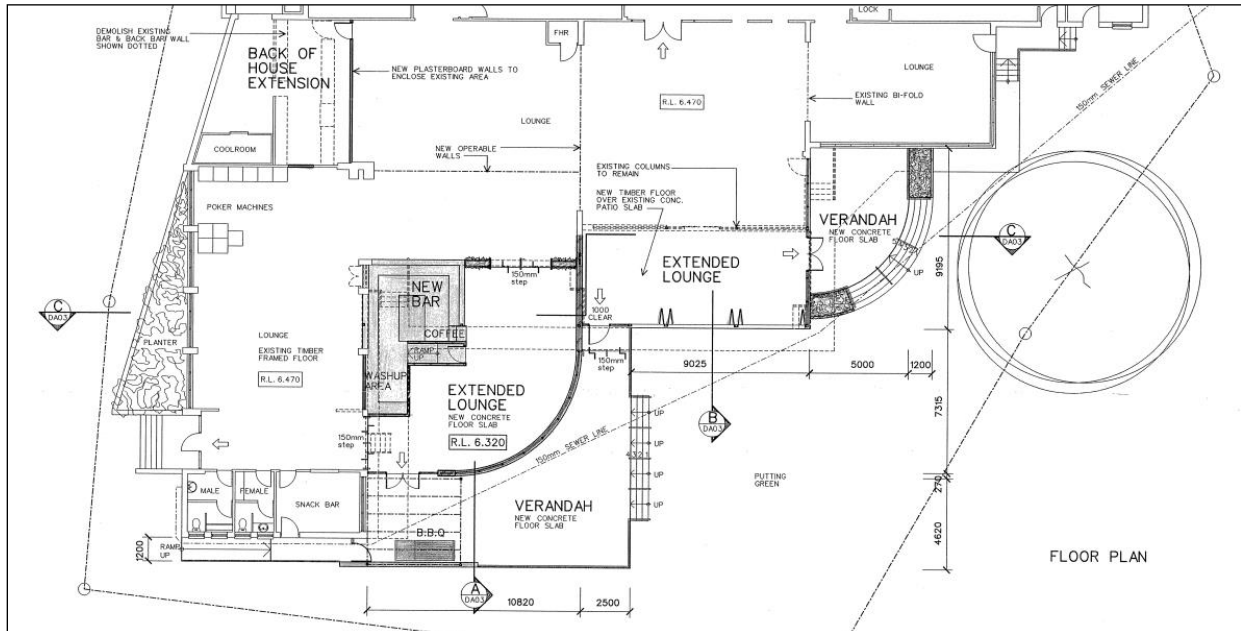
Floor plan of the Approved DA2000/2832 extension and alteration of the Long Reef Golf Club
